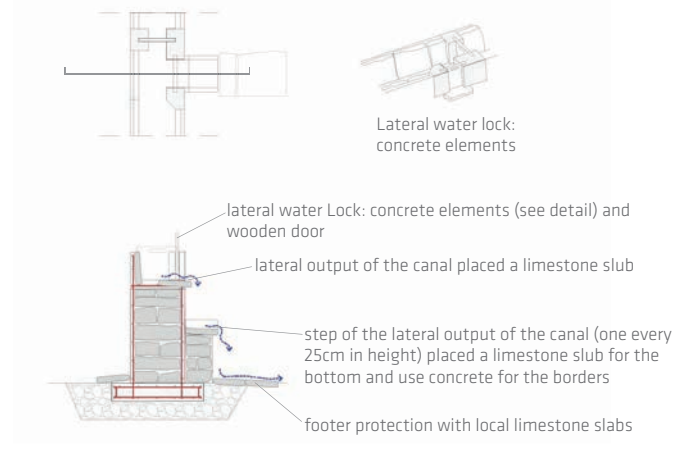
Detail B: connection between 1 lateral canal | 1/20. (By: L. Vallerini).
